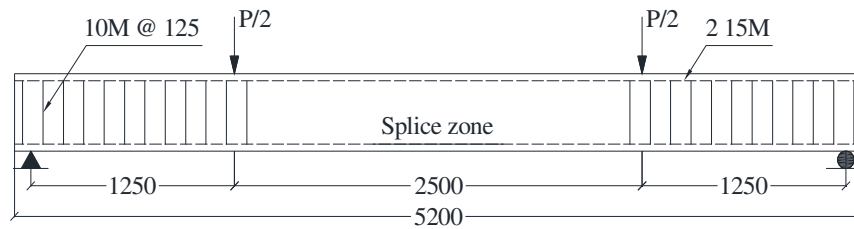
Details of the geometry and transverse reinforcement of the test beams (Note: all dimensions are in mm; 1 mm=0.0394 in.)
